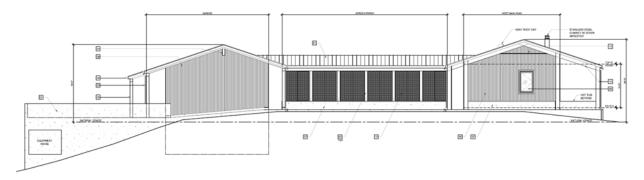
Elevations – Project North (Source for 7a – 7d: IX.1)
